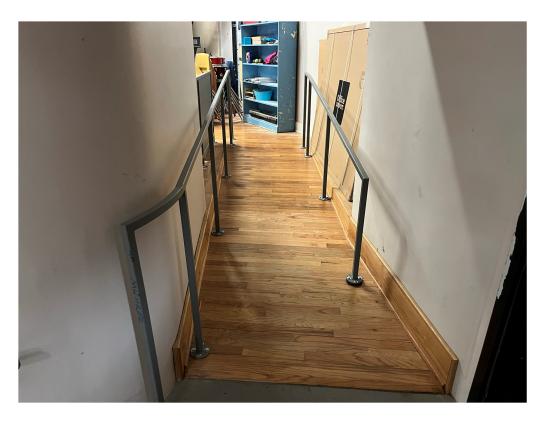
Rail on right to be ~4" further to the right; should stop at wall
